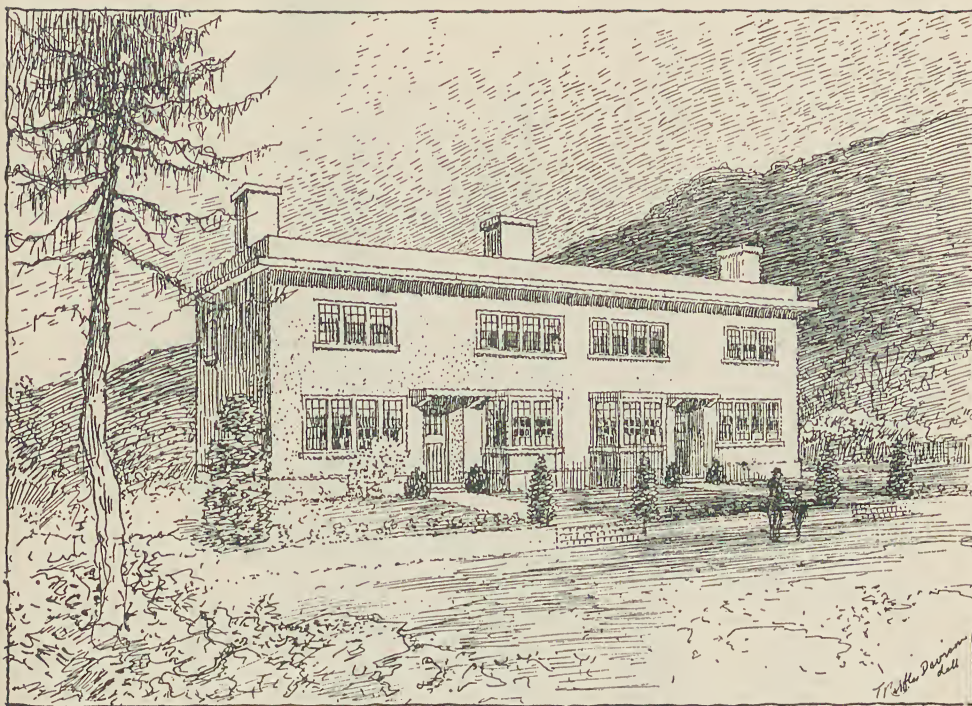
TYPE NO. 3 : WITH FLAT ROOF.
